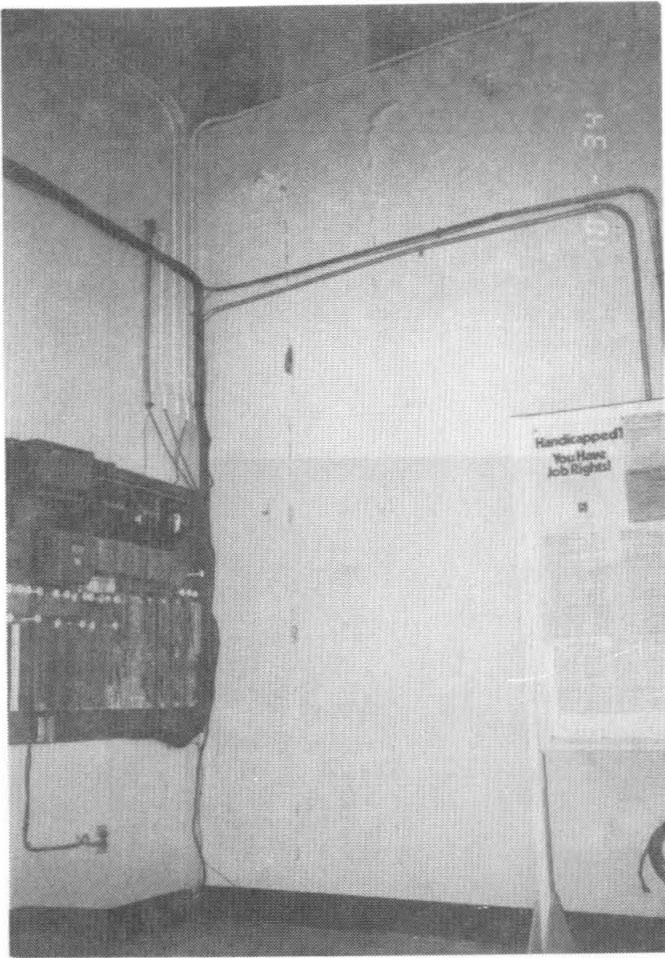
Relative Slip Between Masonry In-Fill and Surrounding Structure at the South Wall
